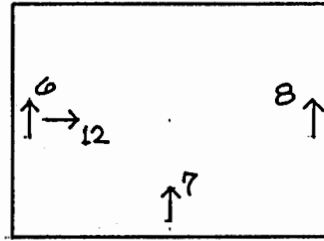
ELEVATIONS AND INSTRUMENTATION PLANS
